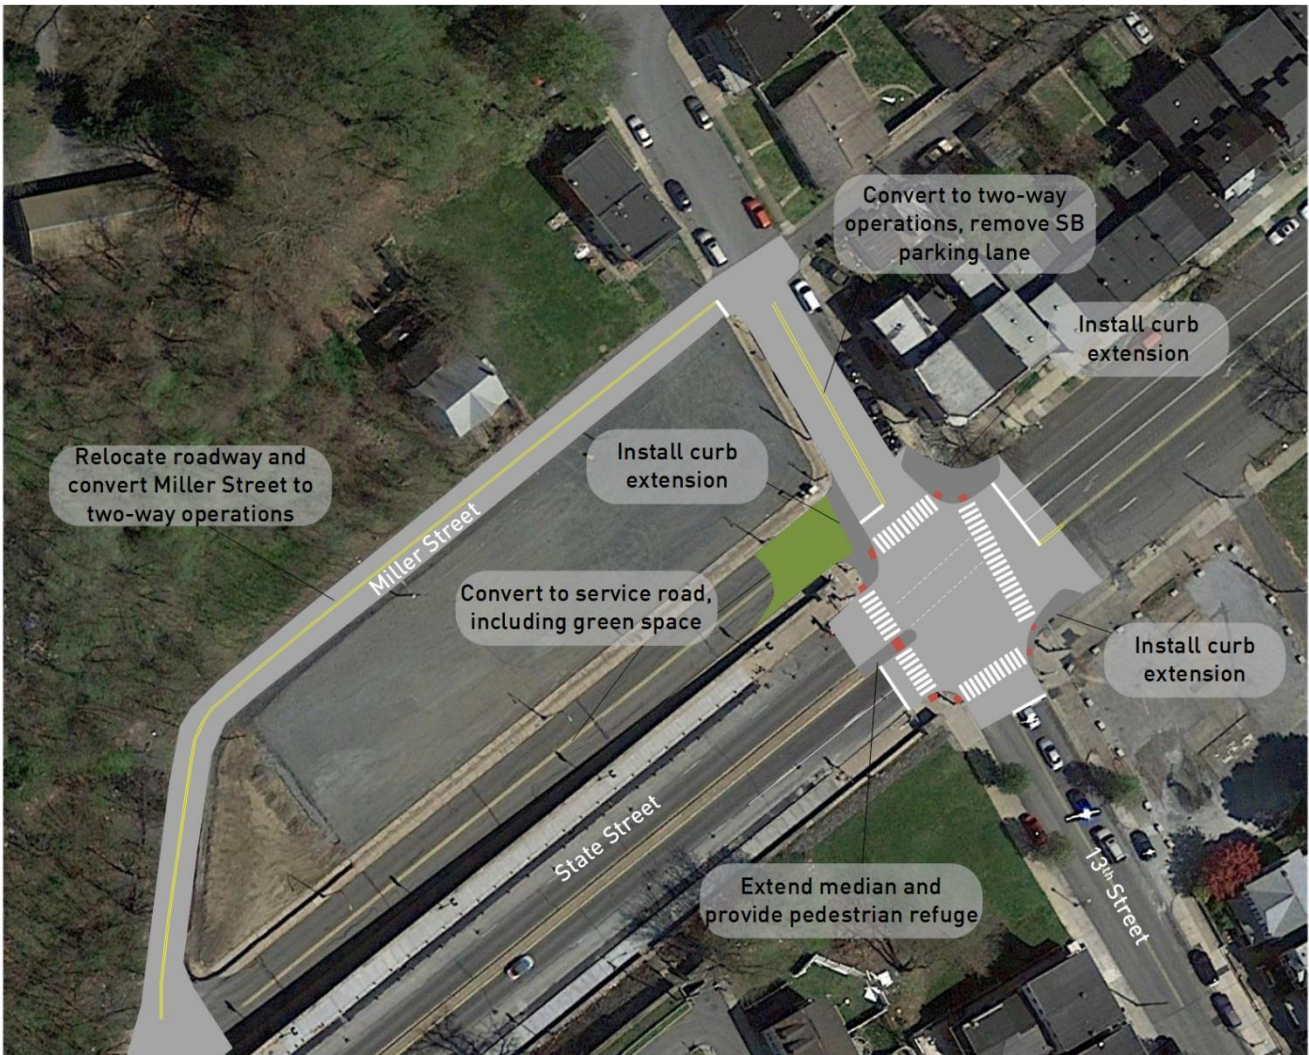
Proposed short/mid-term improvements, State Street at 13th Street
